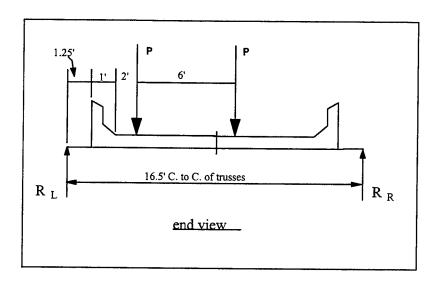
Maximum girder or truss loadings (shown for bending moment only)
